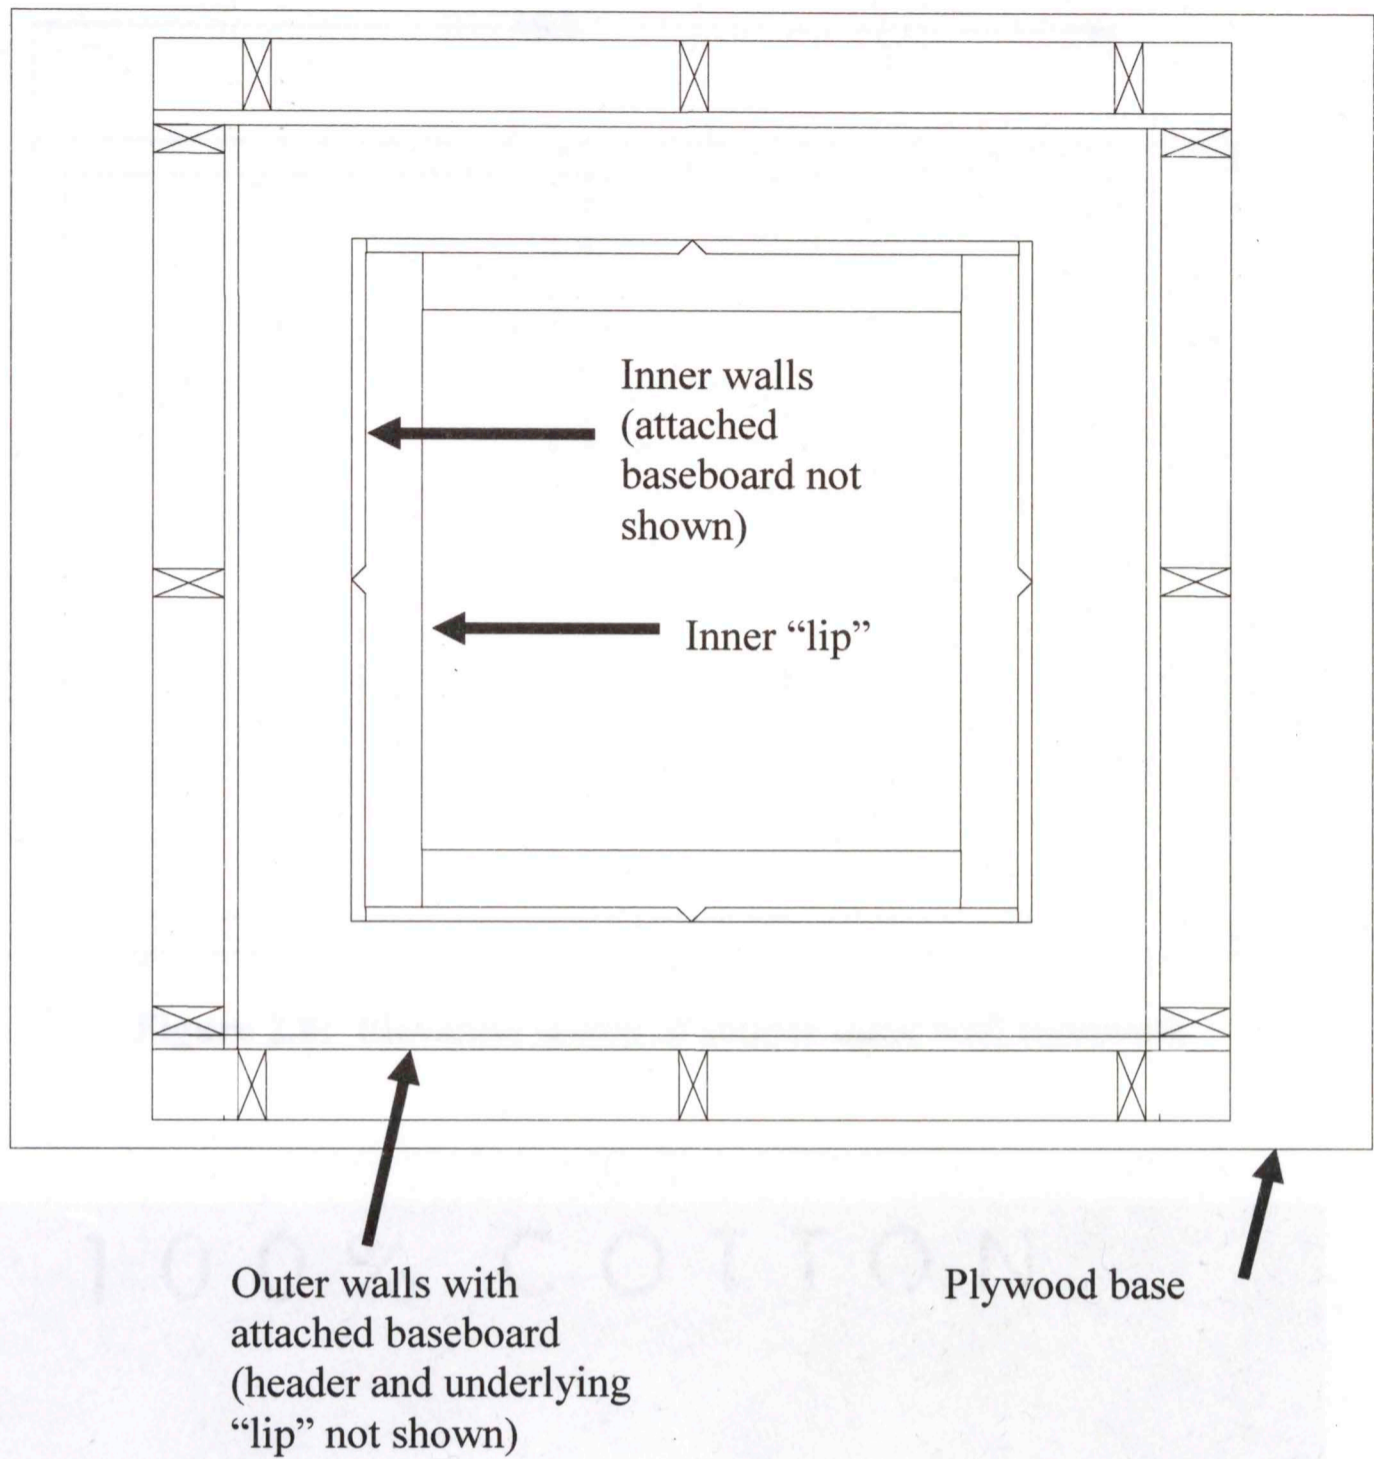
Plan view sketch of base with outer walls (shaketable not shown)
